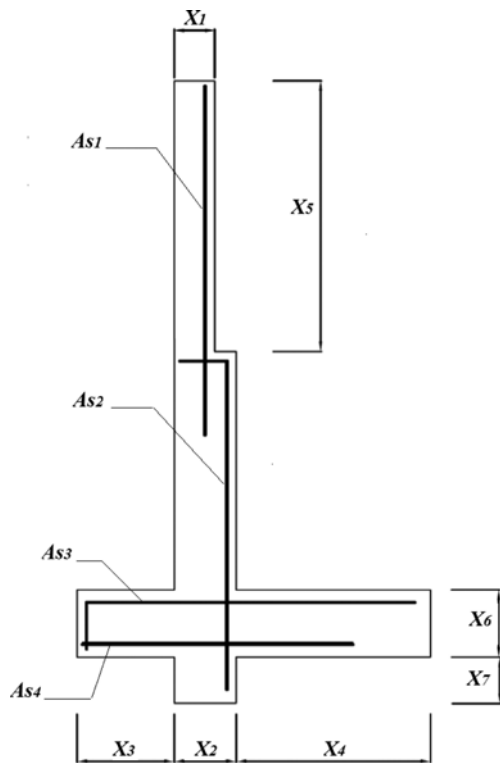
The Design Variables (Concrete Cantilever Retaining Wall)
